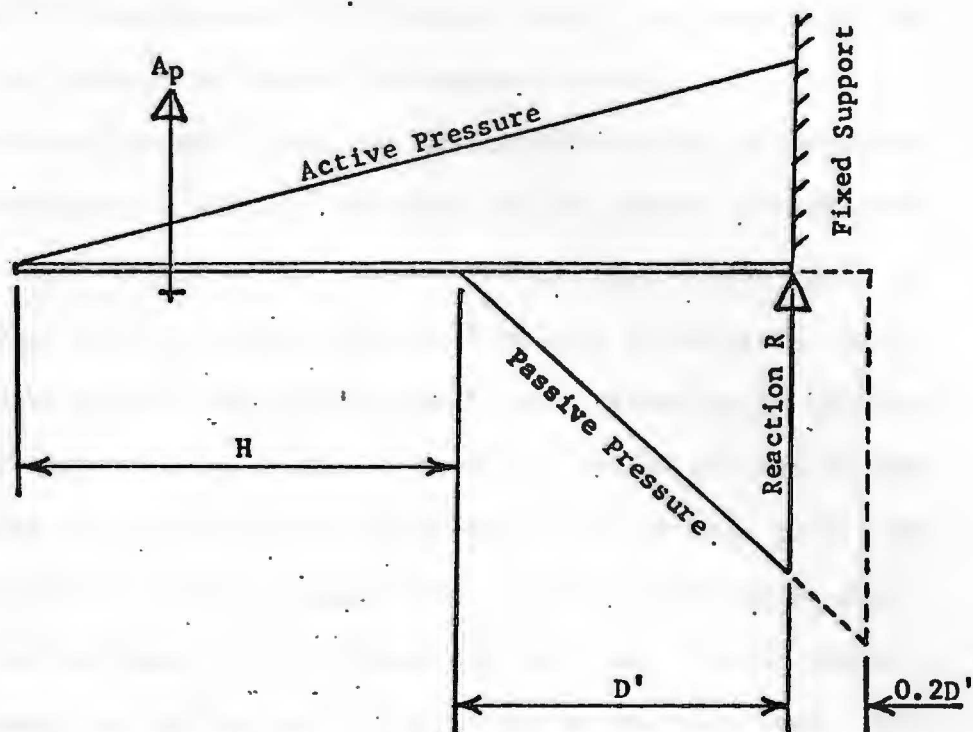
Cantilever Beam Used in Fixed Earth Support Method
